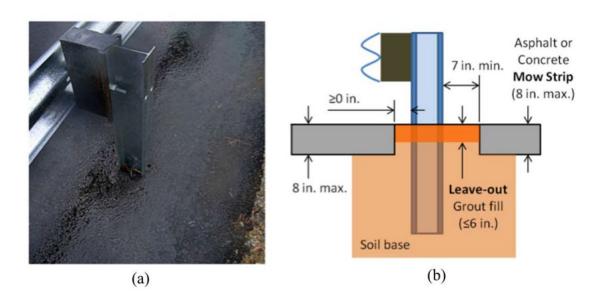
Guardrail Installations: (a) Typical Installation in Georgia; (b) Installation Incorporating Grout Leave-outs as Recommended in the *Roadside Design Guide* [3]
